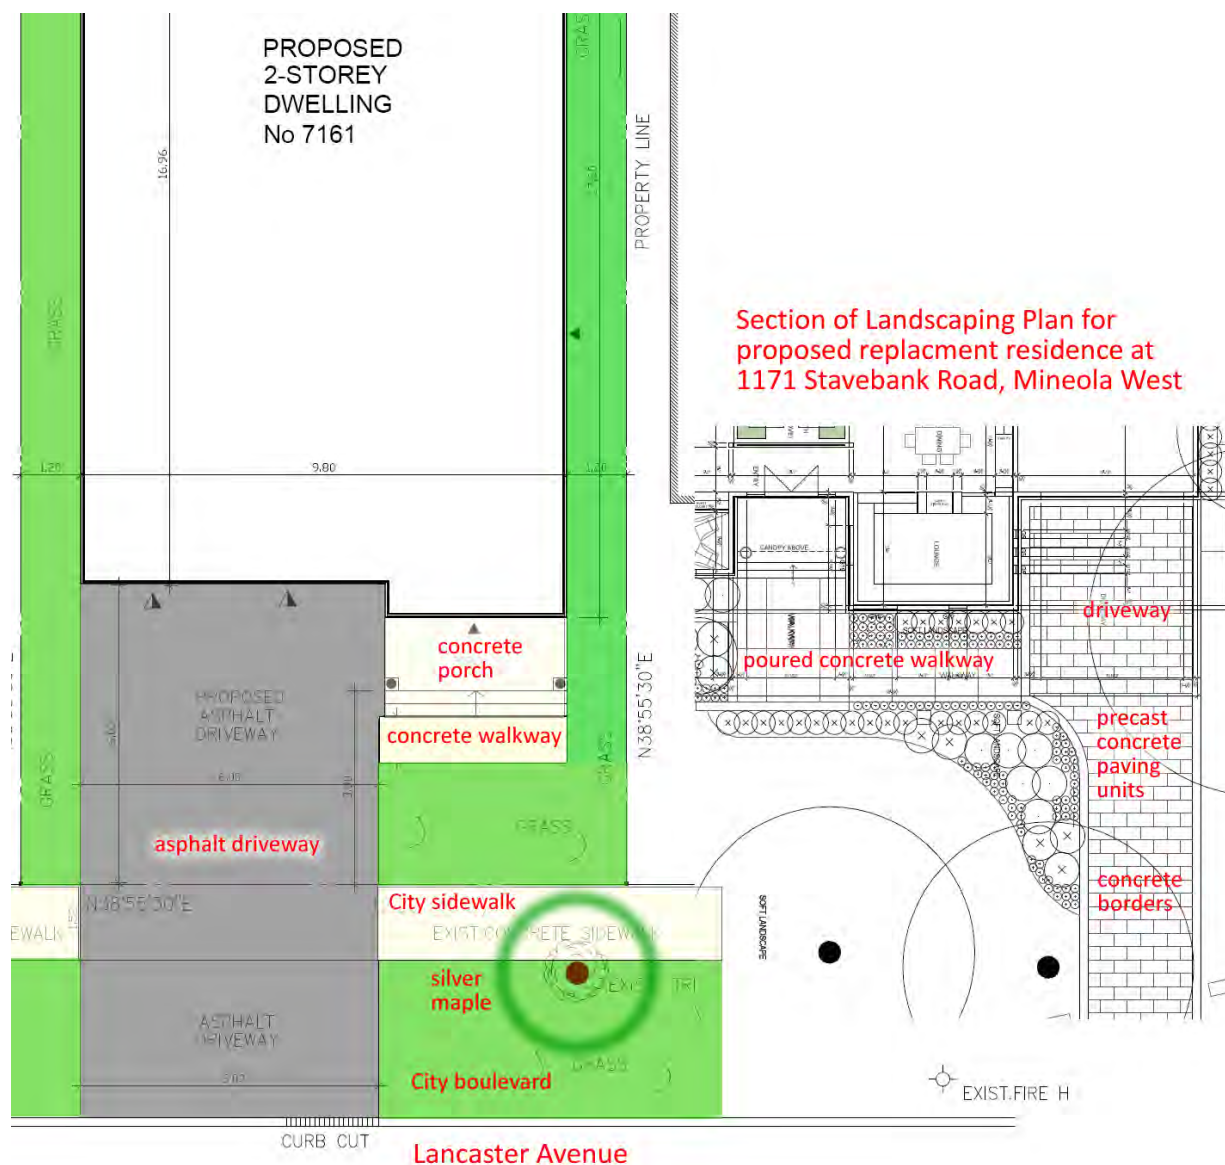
Above left: Site plan showing the location of the proposed double-width asphalt driveway and concrete paving stone walkway. Above right: section of site/ landscaping plan for a proposed replacement dwelling at 1171 Stavebank Road, Mineola West, Mississauga, showing a more attractive driveway treatment with a narrower driveway width between the residence and curb.
